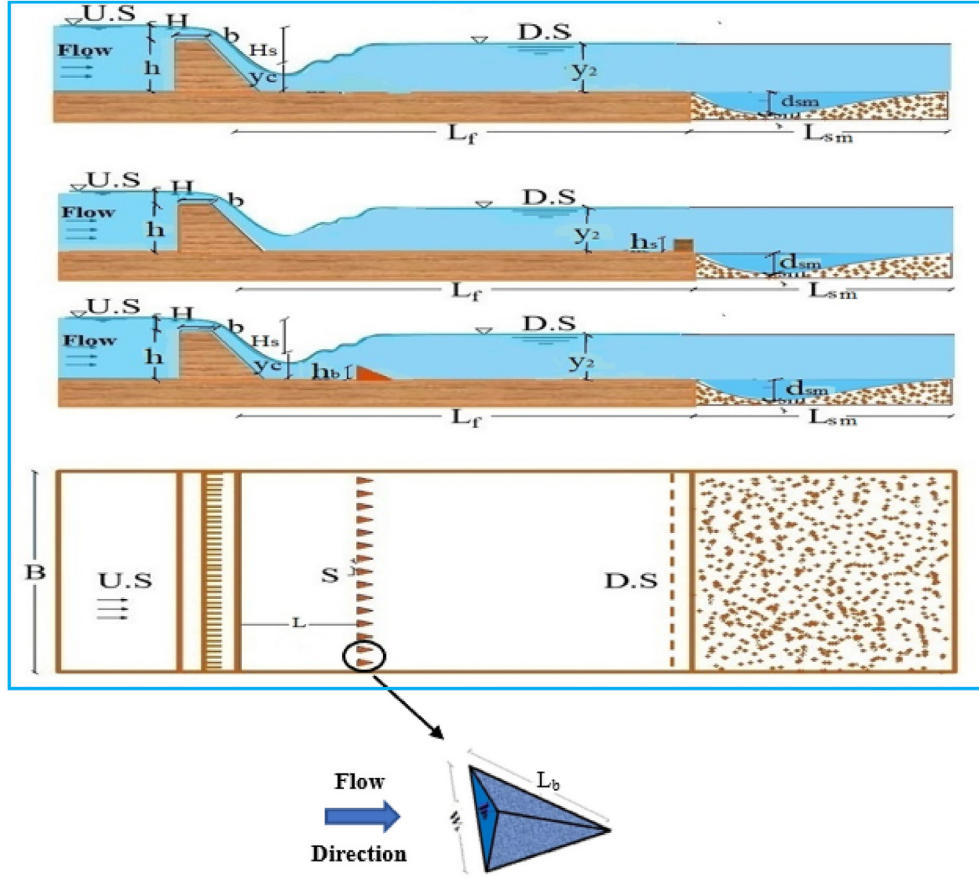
Layout of Fayoum-type weir with rasp head and end sill.
